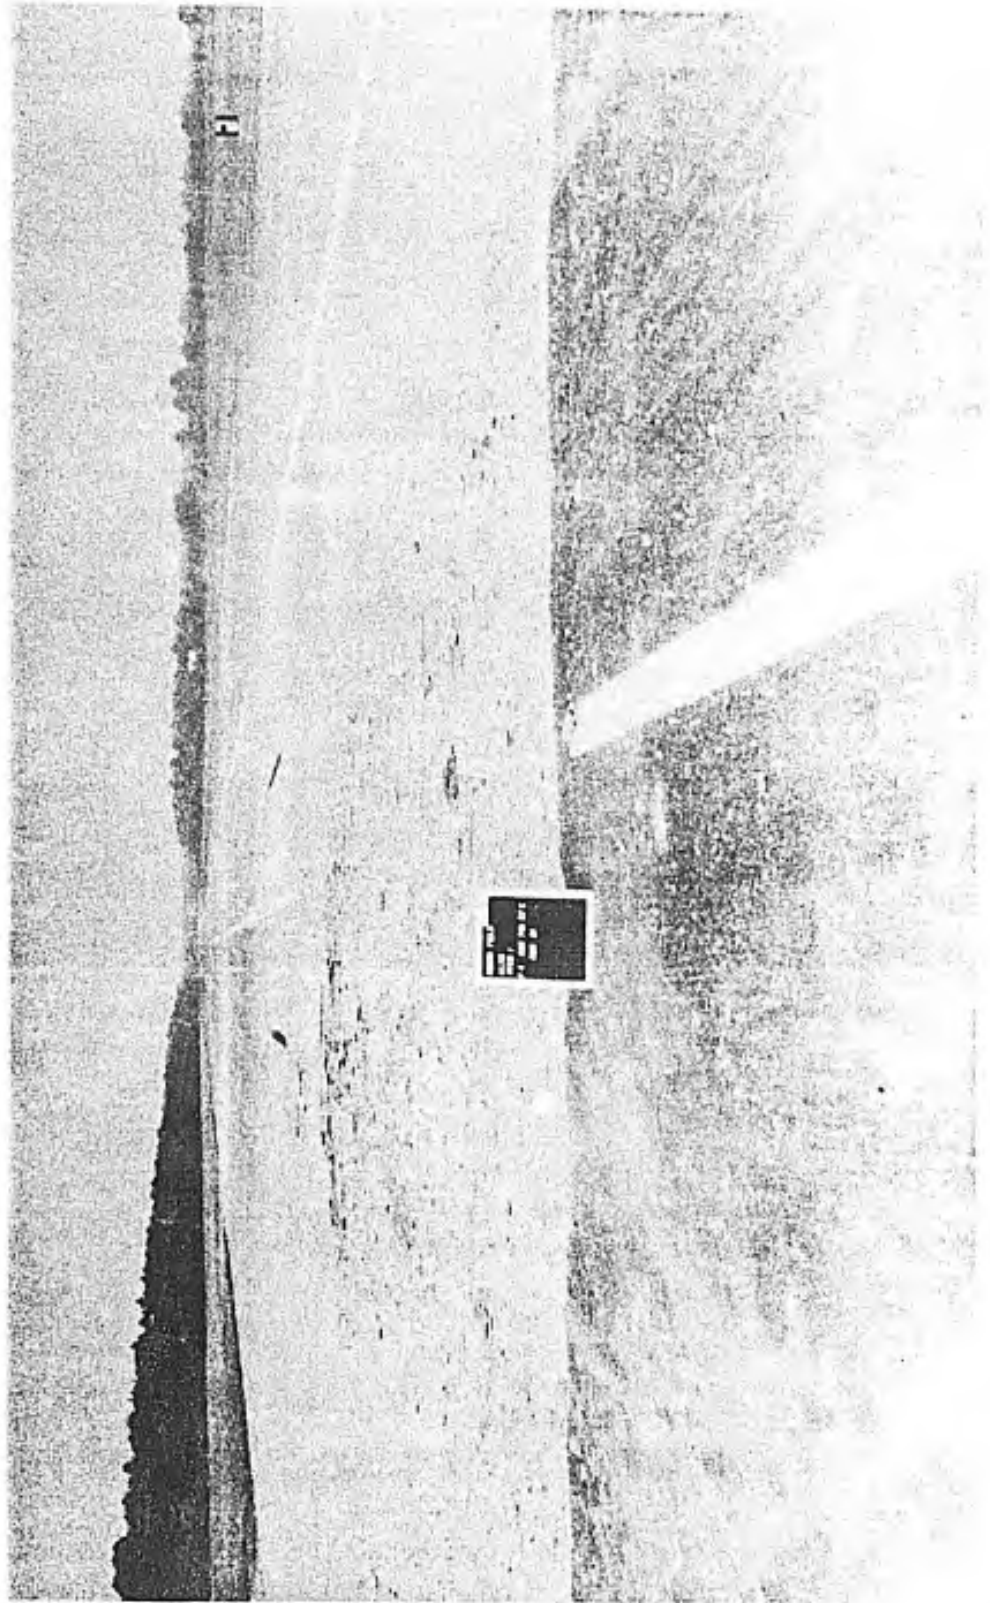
Stabilized Soil Dislodged by F-4 Aircraft.
